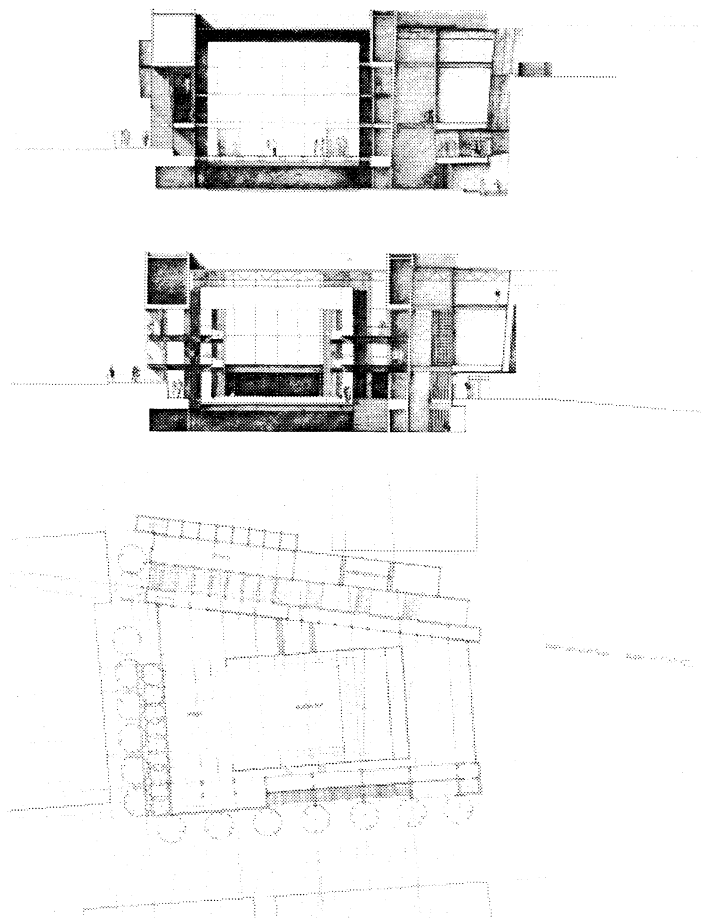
Kid on the Mountain. Petersburg Performing Arts Center based on translation of traditional Double Jig "Kid on the Mountain". Drawings by Andrew Burdick.
